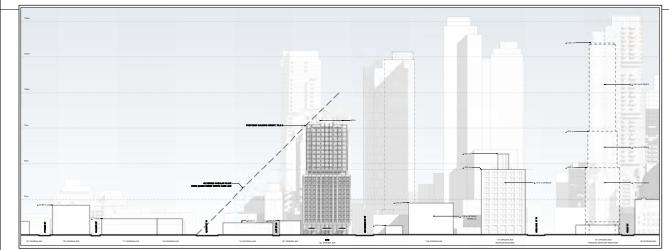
West Elevation Showing Angular Plane Projected from North Curb of Queen Street West (AUDAX)
